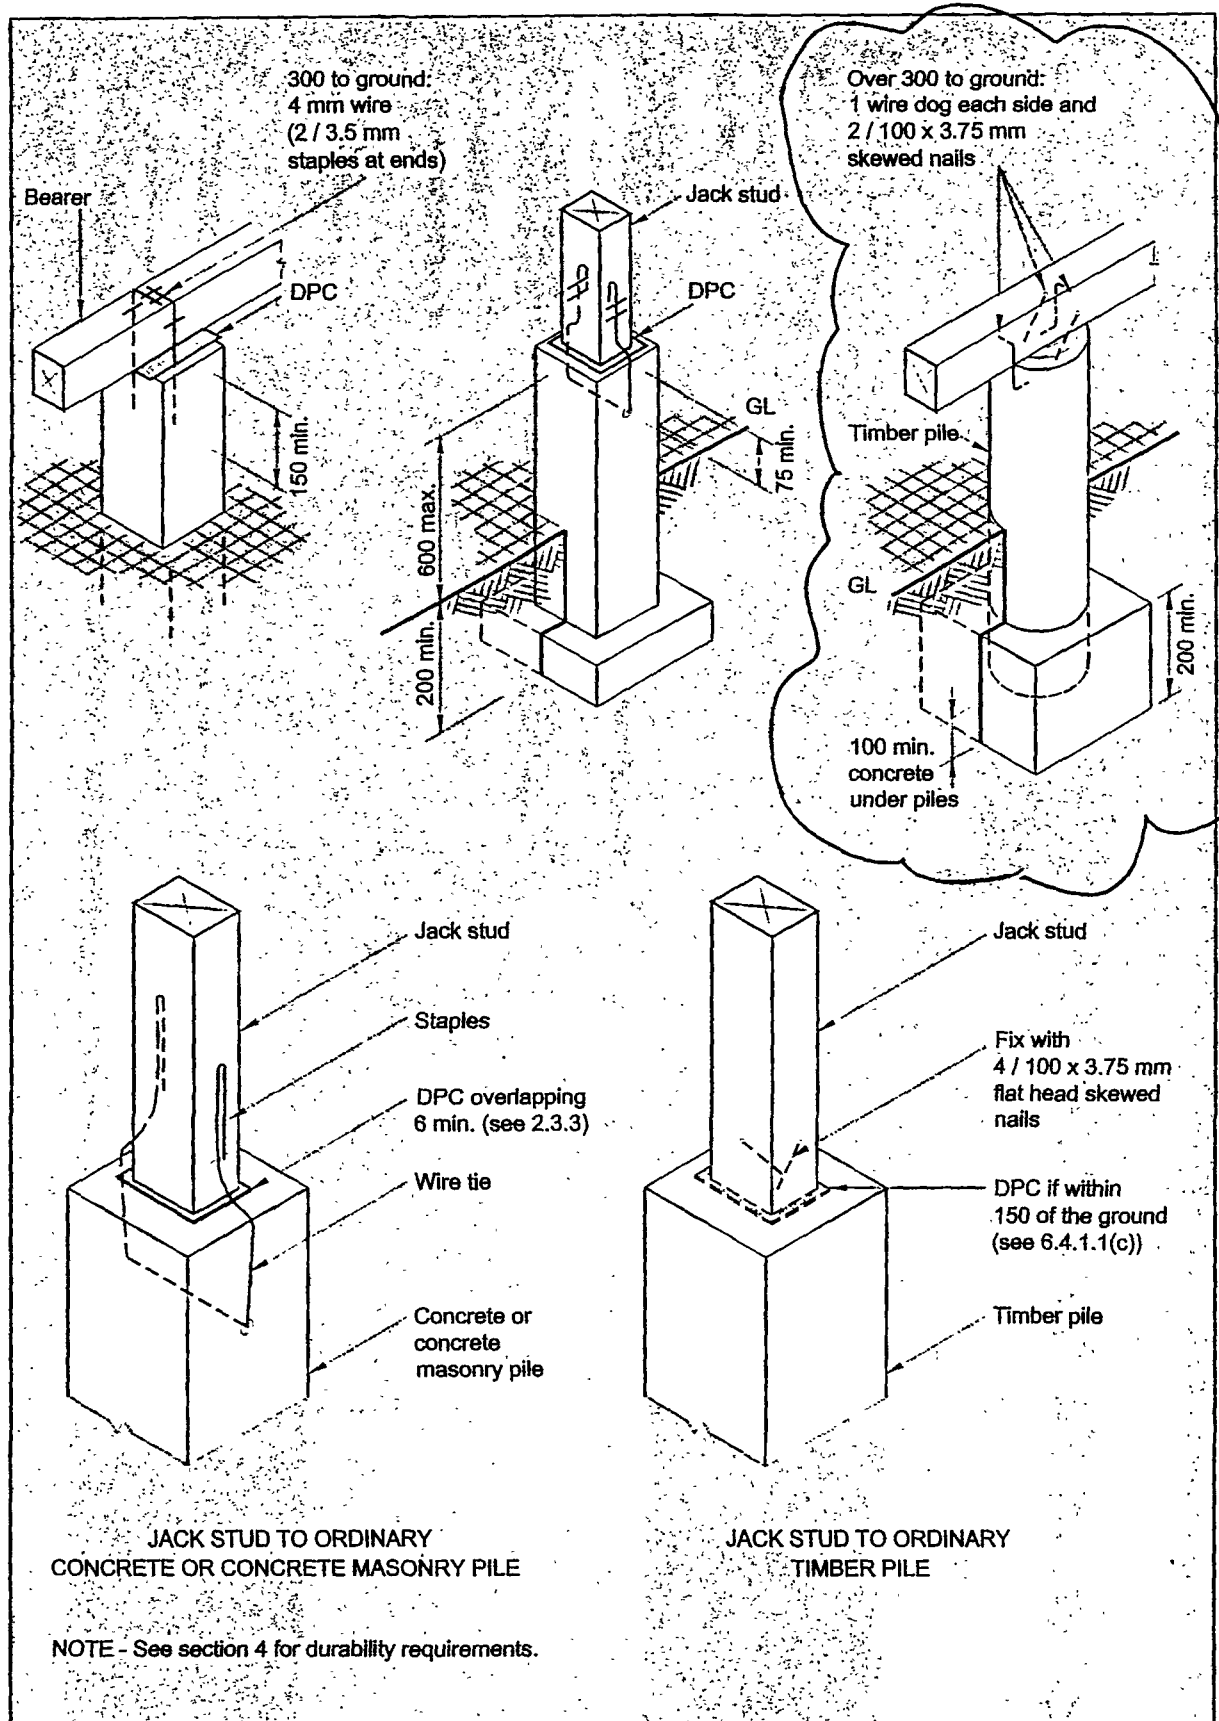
Fixing of bearers and jack studs to ordinary piles (see 6.5.2)
